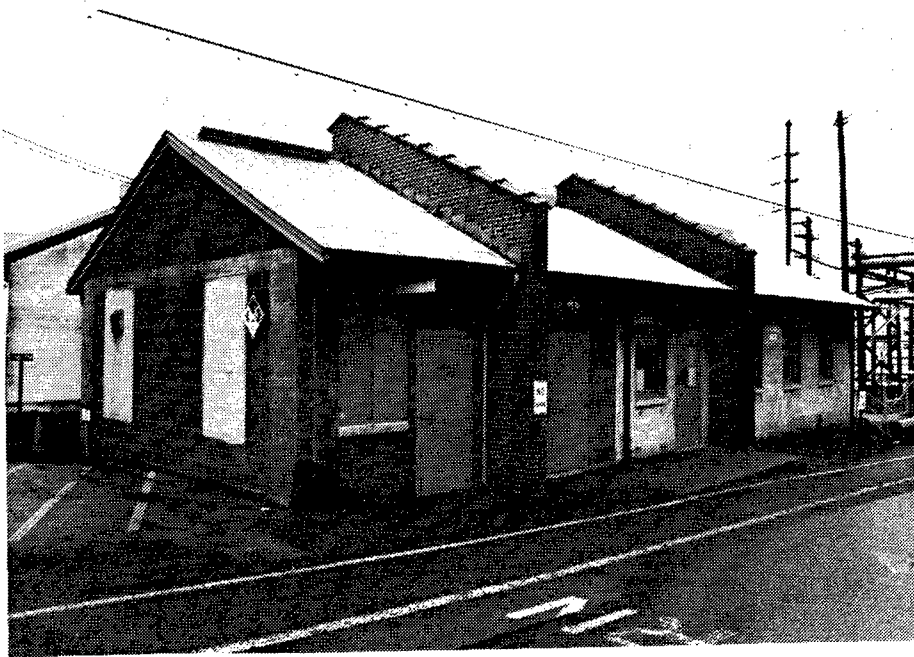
Building 519: Laboratory Storage with brick fire walls dividing the building into thirds to prevent an explosion and/or fire from spreading to the rest of the building.
